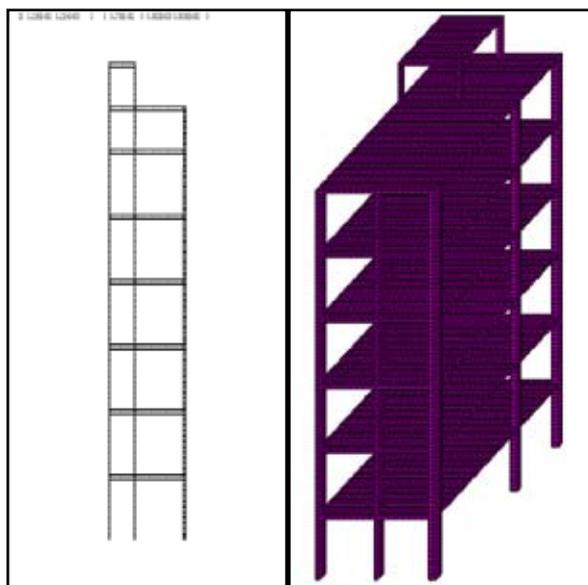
2D and 3D Elevation of Port Building Modelled in AEM
